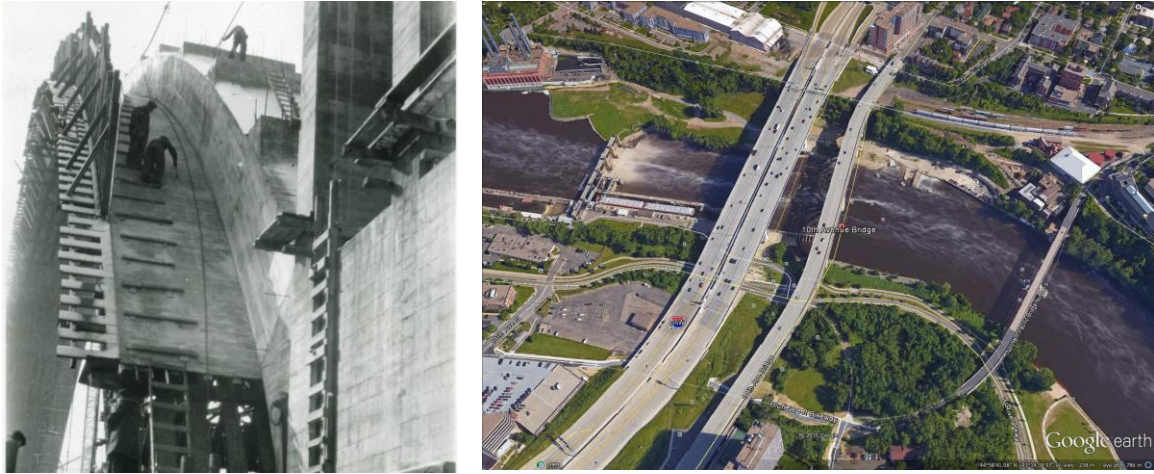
10th Avenue Bridge under construction (left) and aerial view today (right: at centre of photo)
